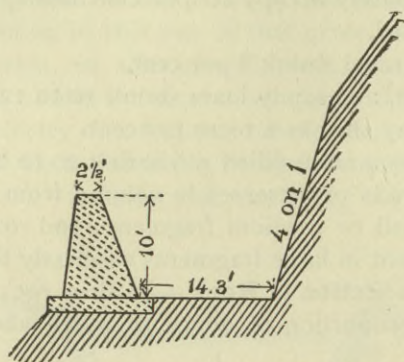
ROCK CROSS-SECTION BEAR RIVER CANAL.
